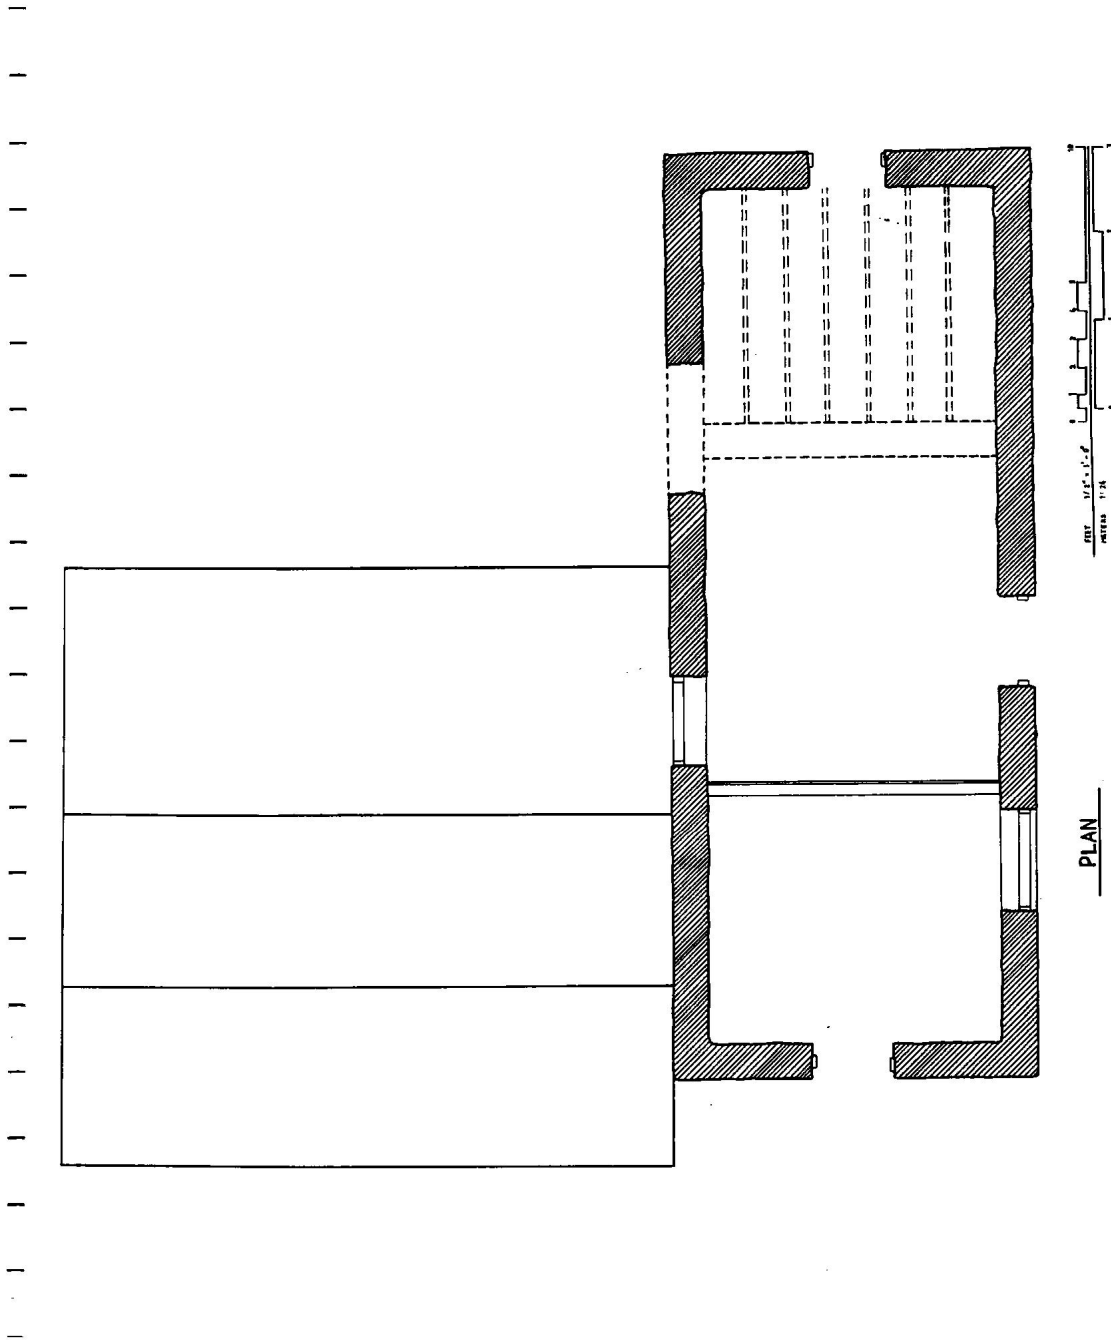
Plan of the stone building and the wood addition. Stone masonry building is outlined with thick masonry walls.
